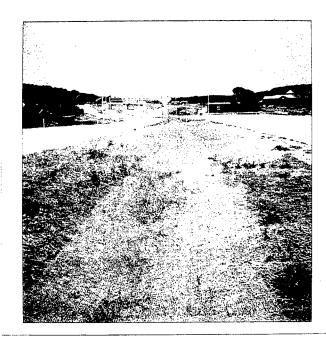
, Final Inspection STA 139+73 to STA 142+07 Lt. Swale
